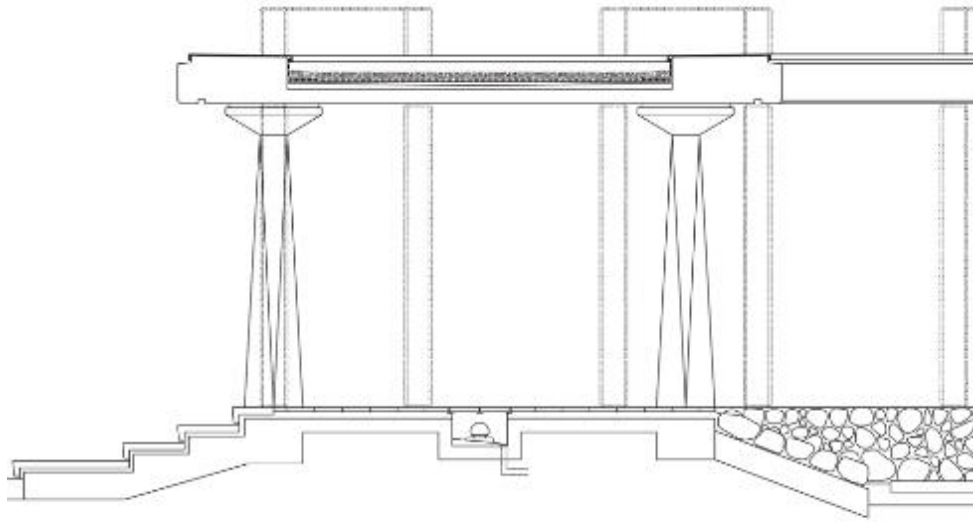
An arcade composed of sculptural columns, U form niche walls, terrazzo tiles with recessed lighting, and L form roof plate connects the professor blocks and main entrance hallway. (Produced by the Author)
